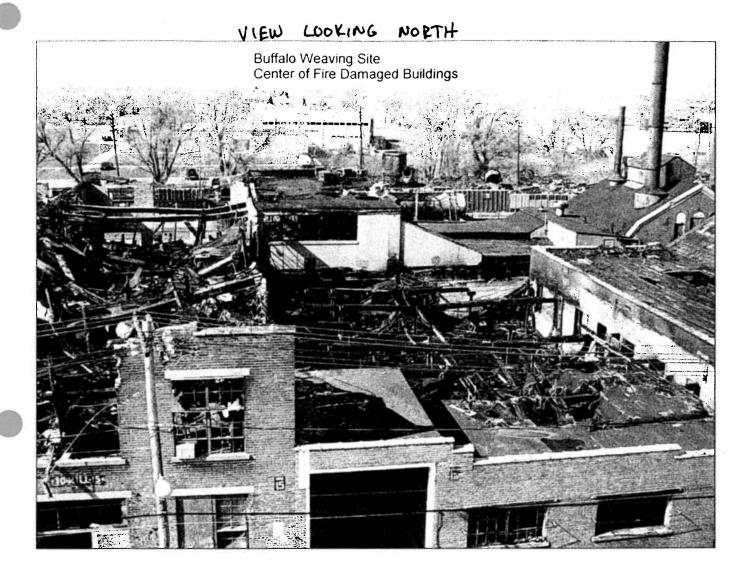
Buffalo Weaving Site Site Photograph VIEW LOOKING NORTHEAST
